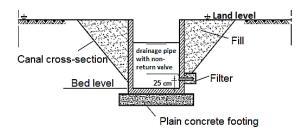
Constructing a rectangle cross-section of reinforced concrete walls
